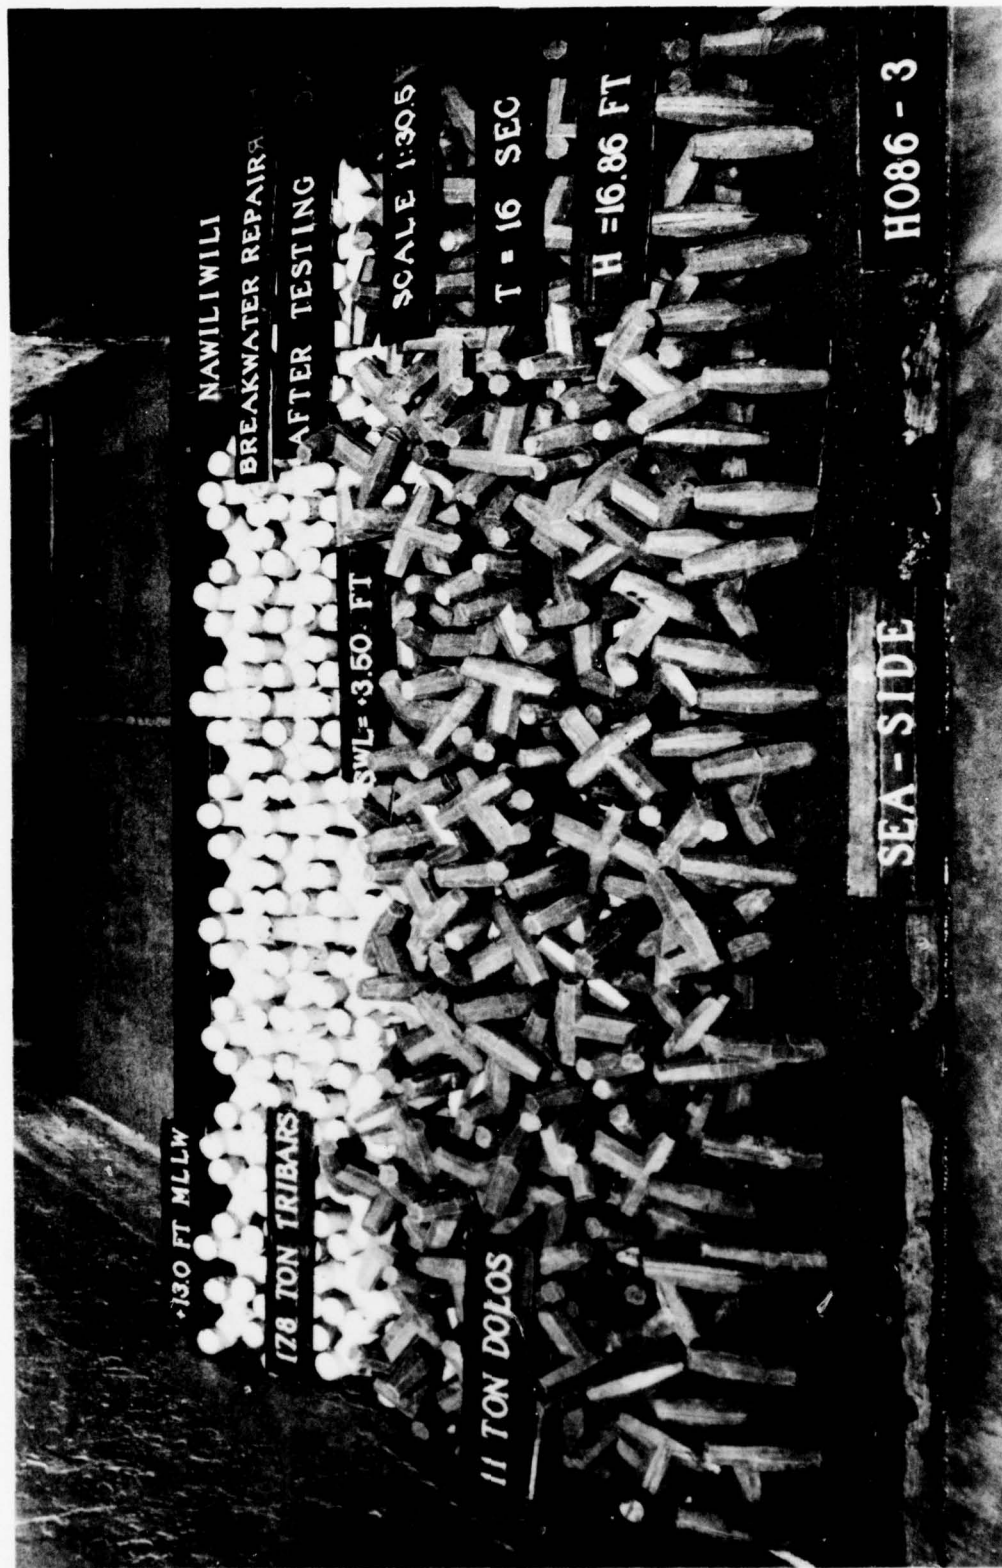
Sea-side view of test section 1 after testing with 16-sec, 16.9-ft wave at +3.5 ft mllw swl
